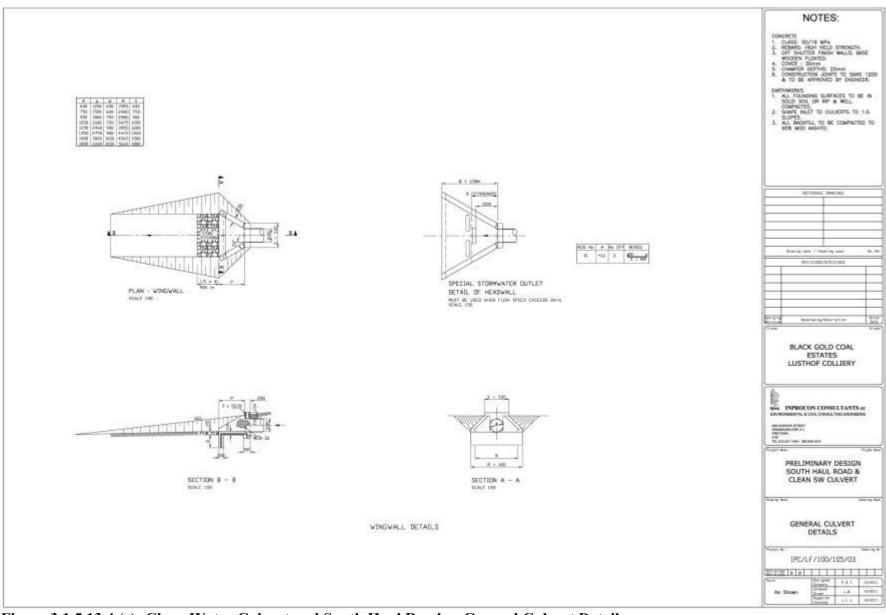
(c): Clean Water Culvert and South Haul Road - General Culvert Details.
